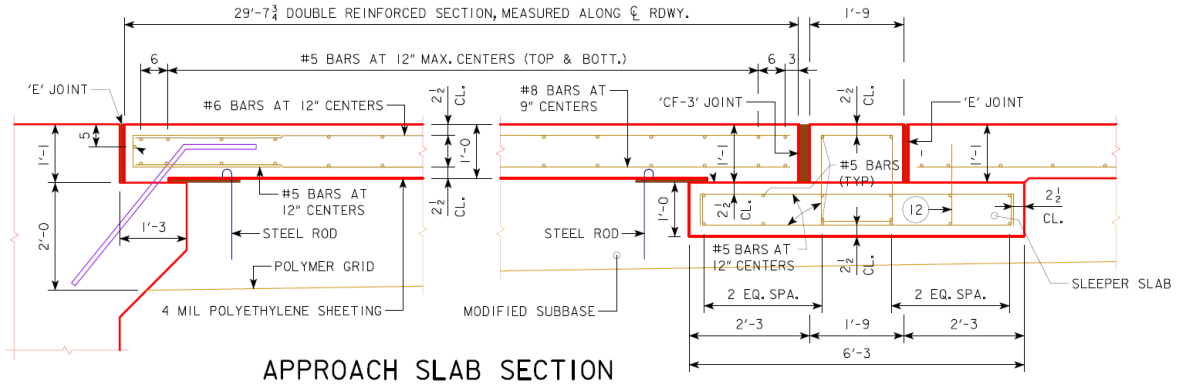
Story - Approach Slab Section and Dimensions (Iowa DOT)
